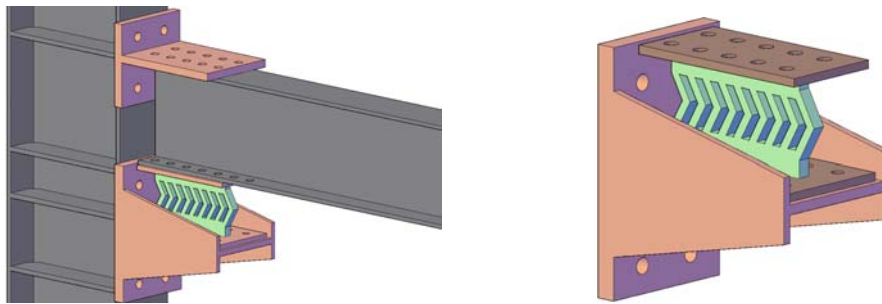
The Details of Beam-column Joint Utilizing a Slit Damper.
